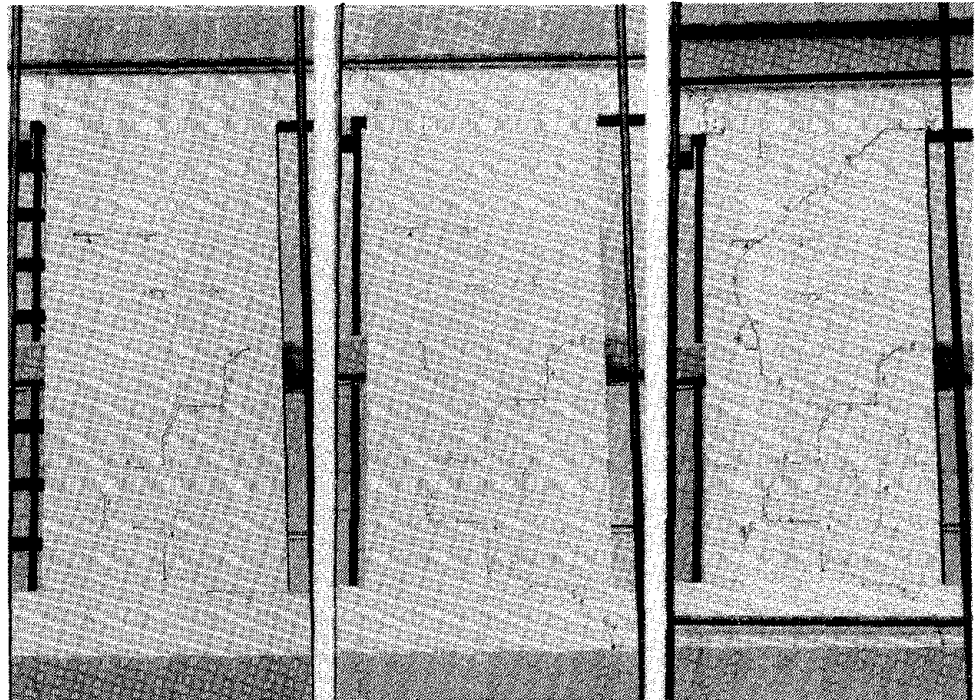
SUCCESSIVE CRACK FORMATION TEST 7. (RIGHT SIDE PIER)
